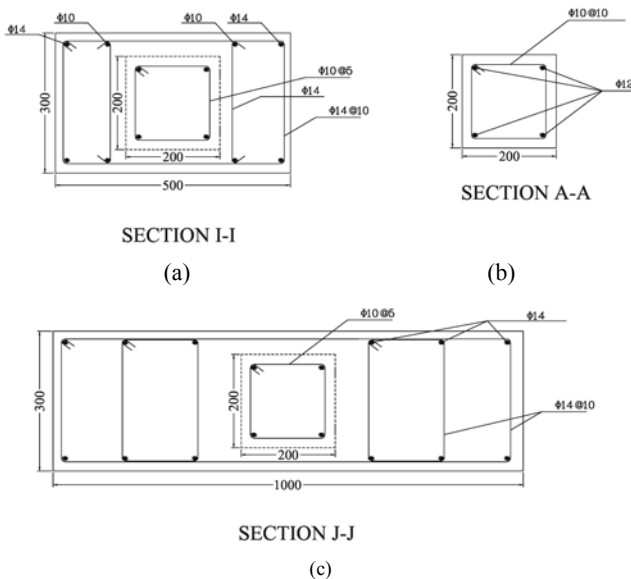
Cross sections of cap beam, column and foundation (dimensions in mm)
